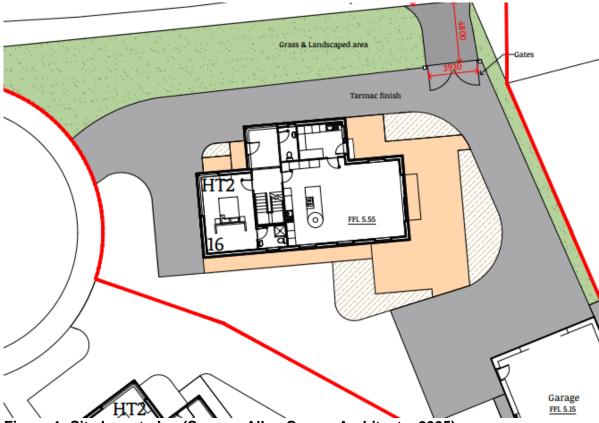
Site layout plan (Source: Allan Curran Architects, 2025).
